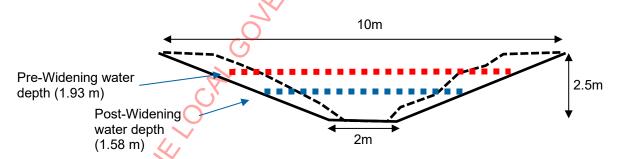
Sketch of proposed stream widening between Norfolk Street and Wellington Road
